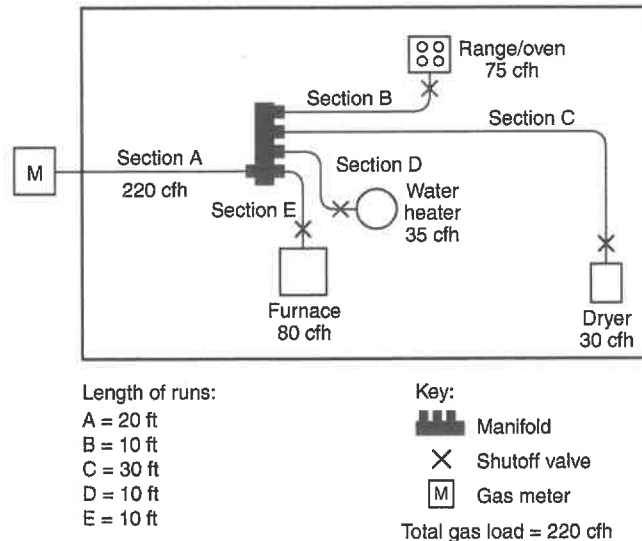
Piping Plan Showing a Copper Tubing System.
